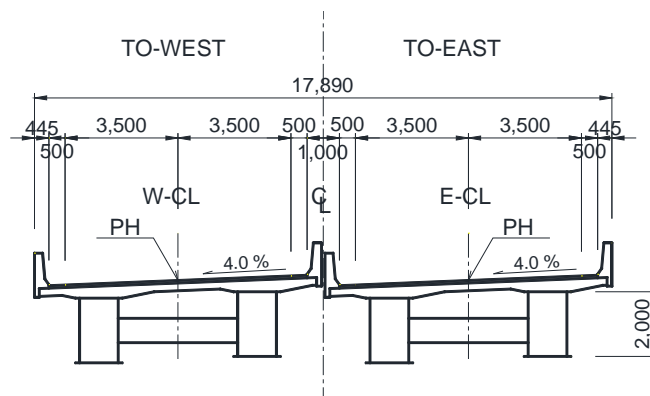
(1) Typical Cross Section of General Bridge Section
